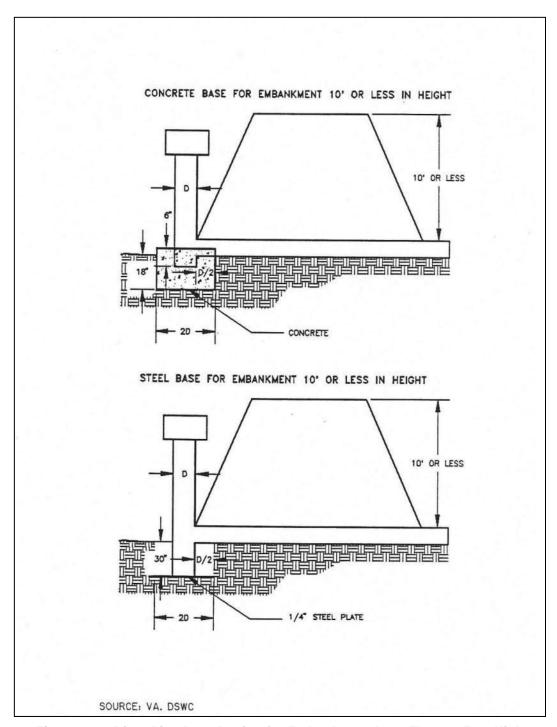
Riser Pipe Base Design for Embankment Less Than 10 Feet High
